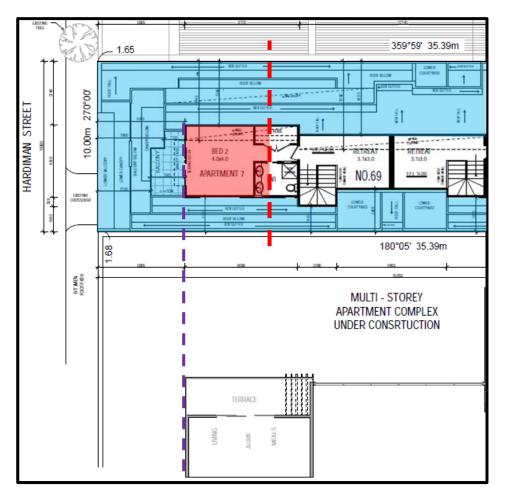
Notated excerpt from 'Fourth Floor Plan', prepared by NRG Building Designs Pty Itd
